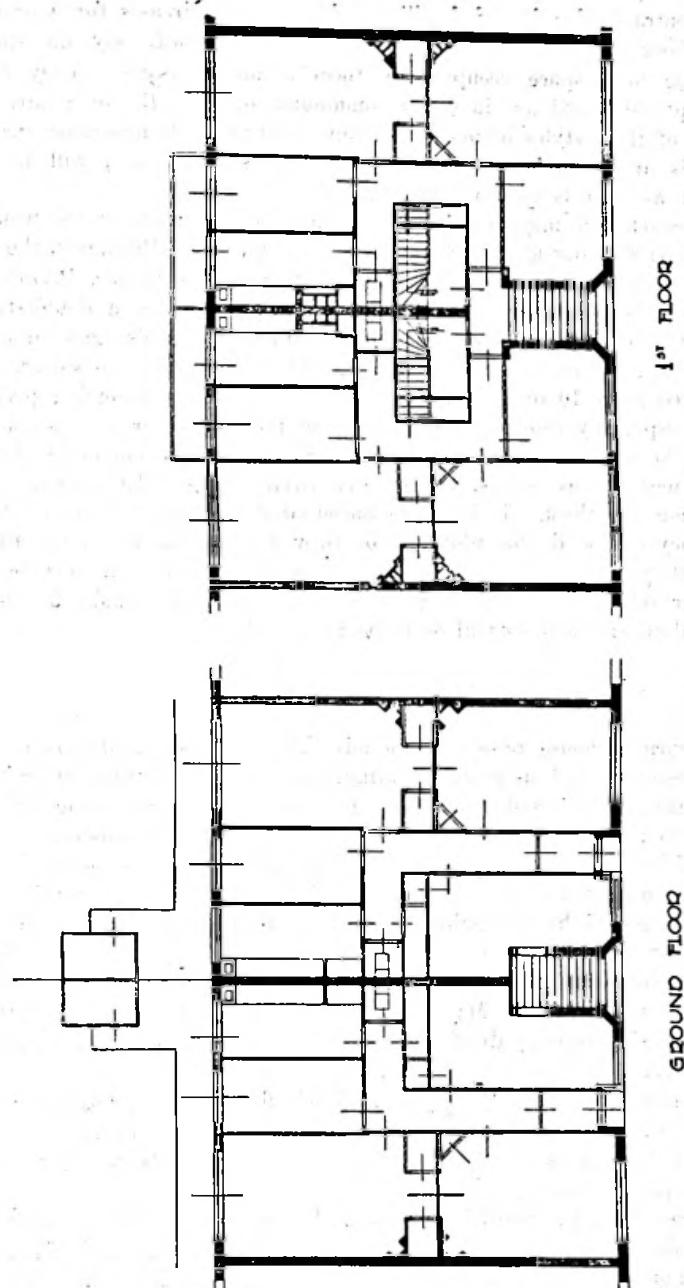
Ground and first floor flats with separate street doors Veranda and common staircase for second floor.
